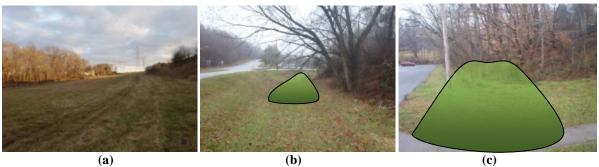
(a) Drainage area to proposed new wet pond (RRI_17); (b) Proposed location for extended detention pond (RRI_8); and (c) Proposed location for extended detention pond (RRI_16).
